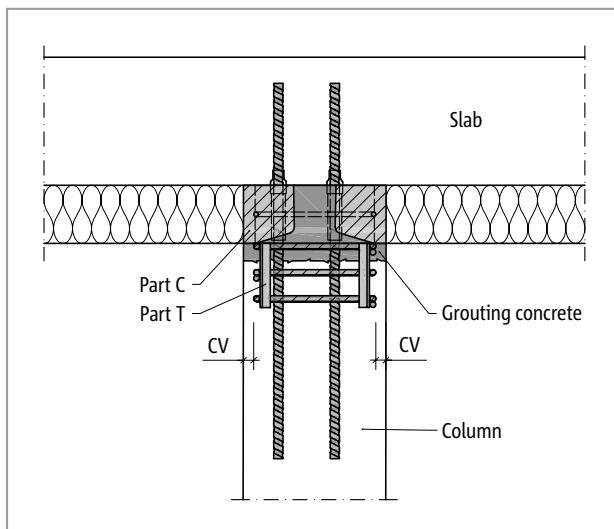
Schöck Sconnex® type P: Installation section; connection column – floor with Part C and Part T
